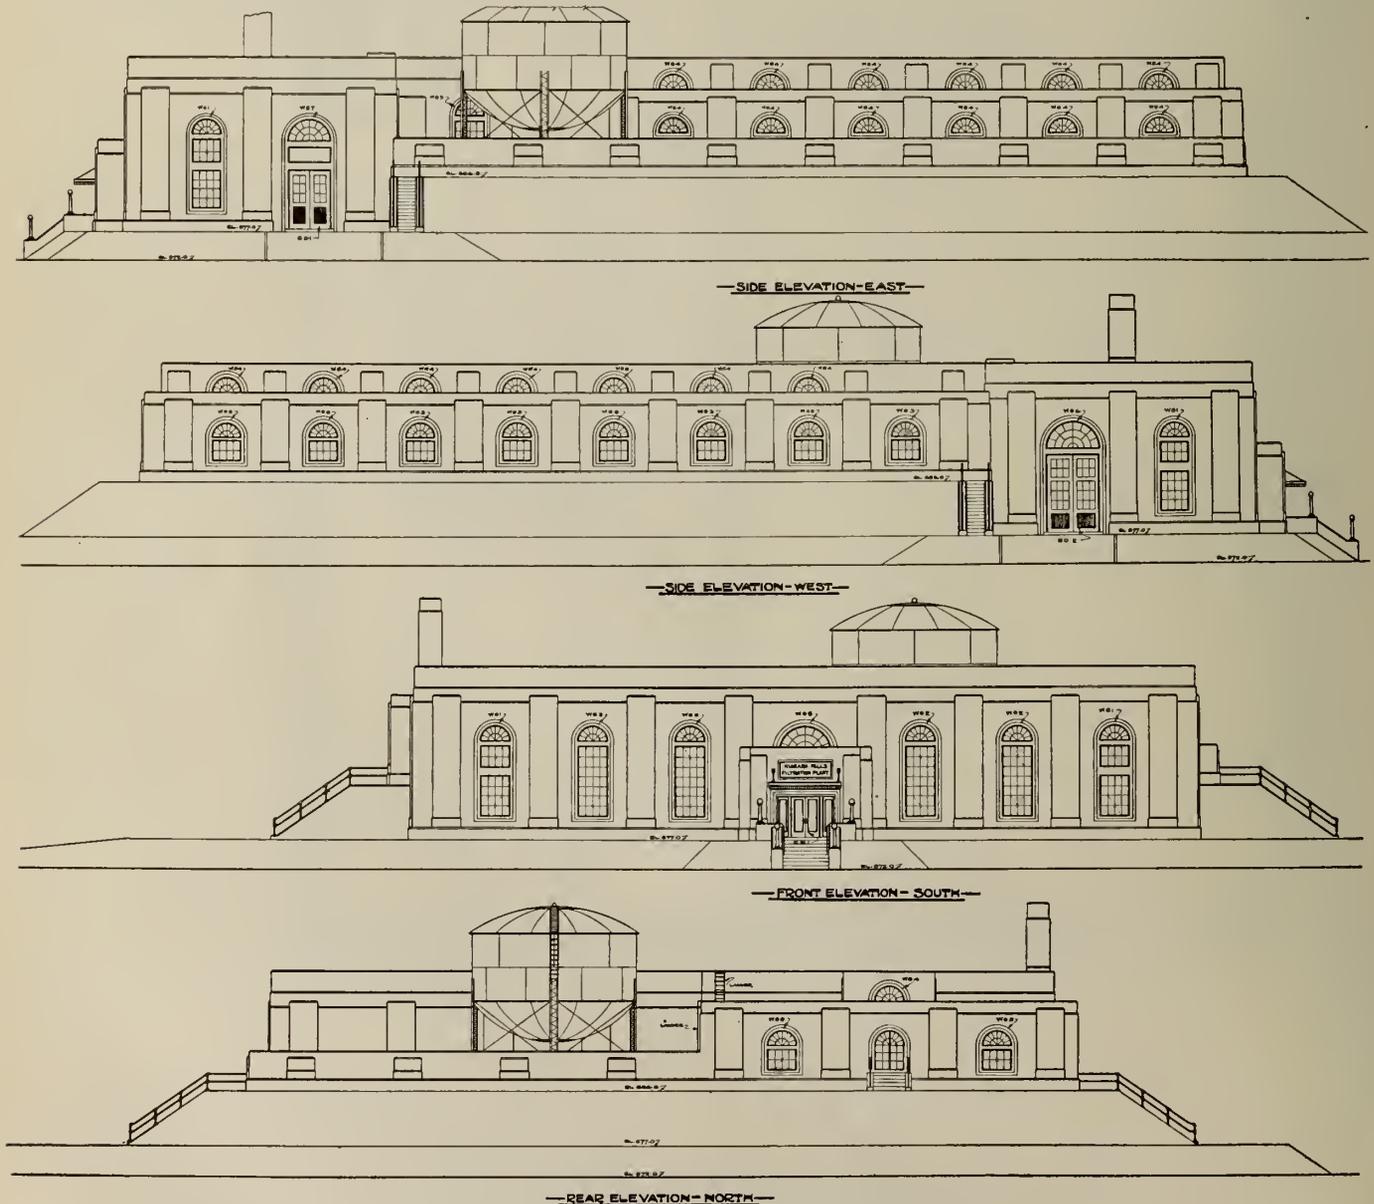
Exterior Elevations of Superstructure of Filtration Plant.
